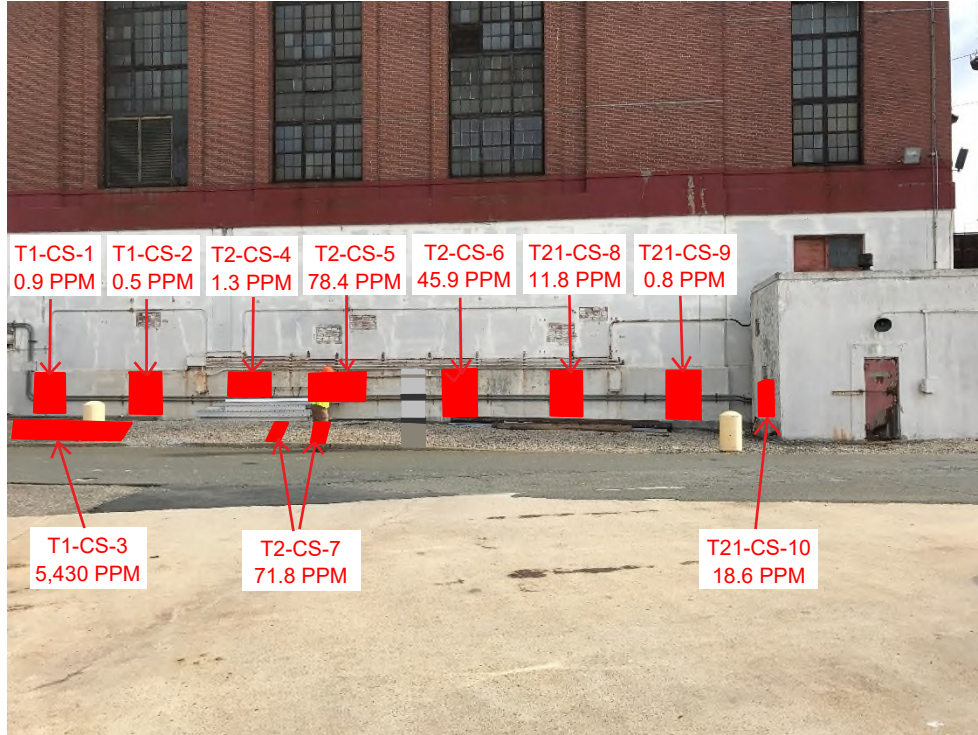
Transformer 1, 2, and 21 Area looking north at Mystic 1 building
